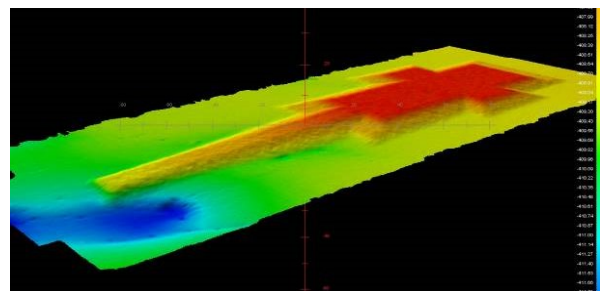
FPSO towhead rock berm with a ramp and two wings to support risers exiting the towhead.
